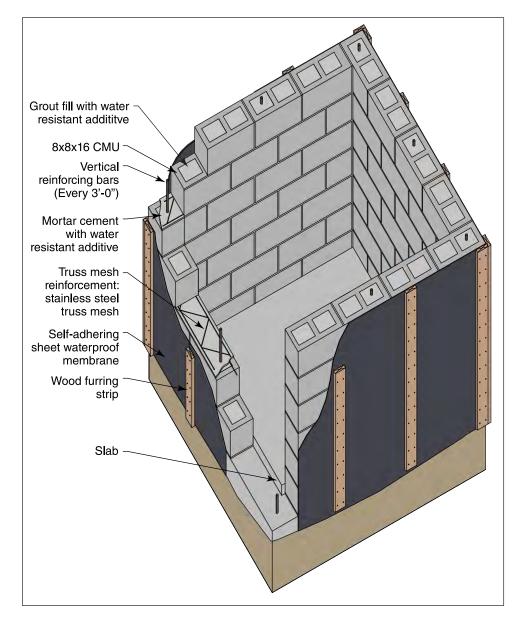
Cross section of the test mock-up used for the SERRI tests of a substantially impermeable CMU wall system (SERRI Report) – Not intended for design purposes
